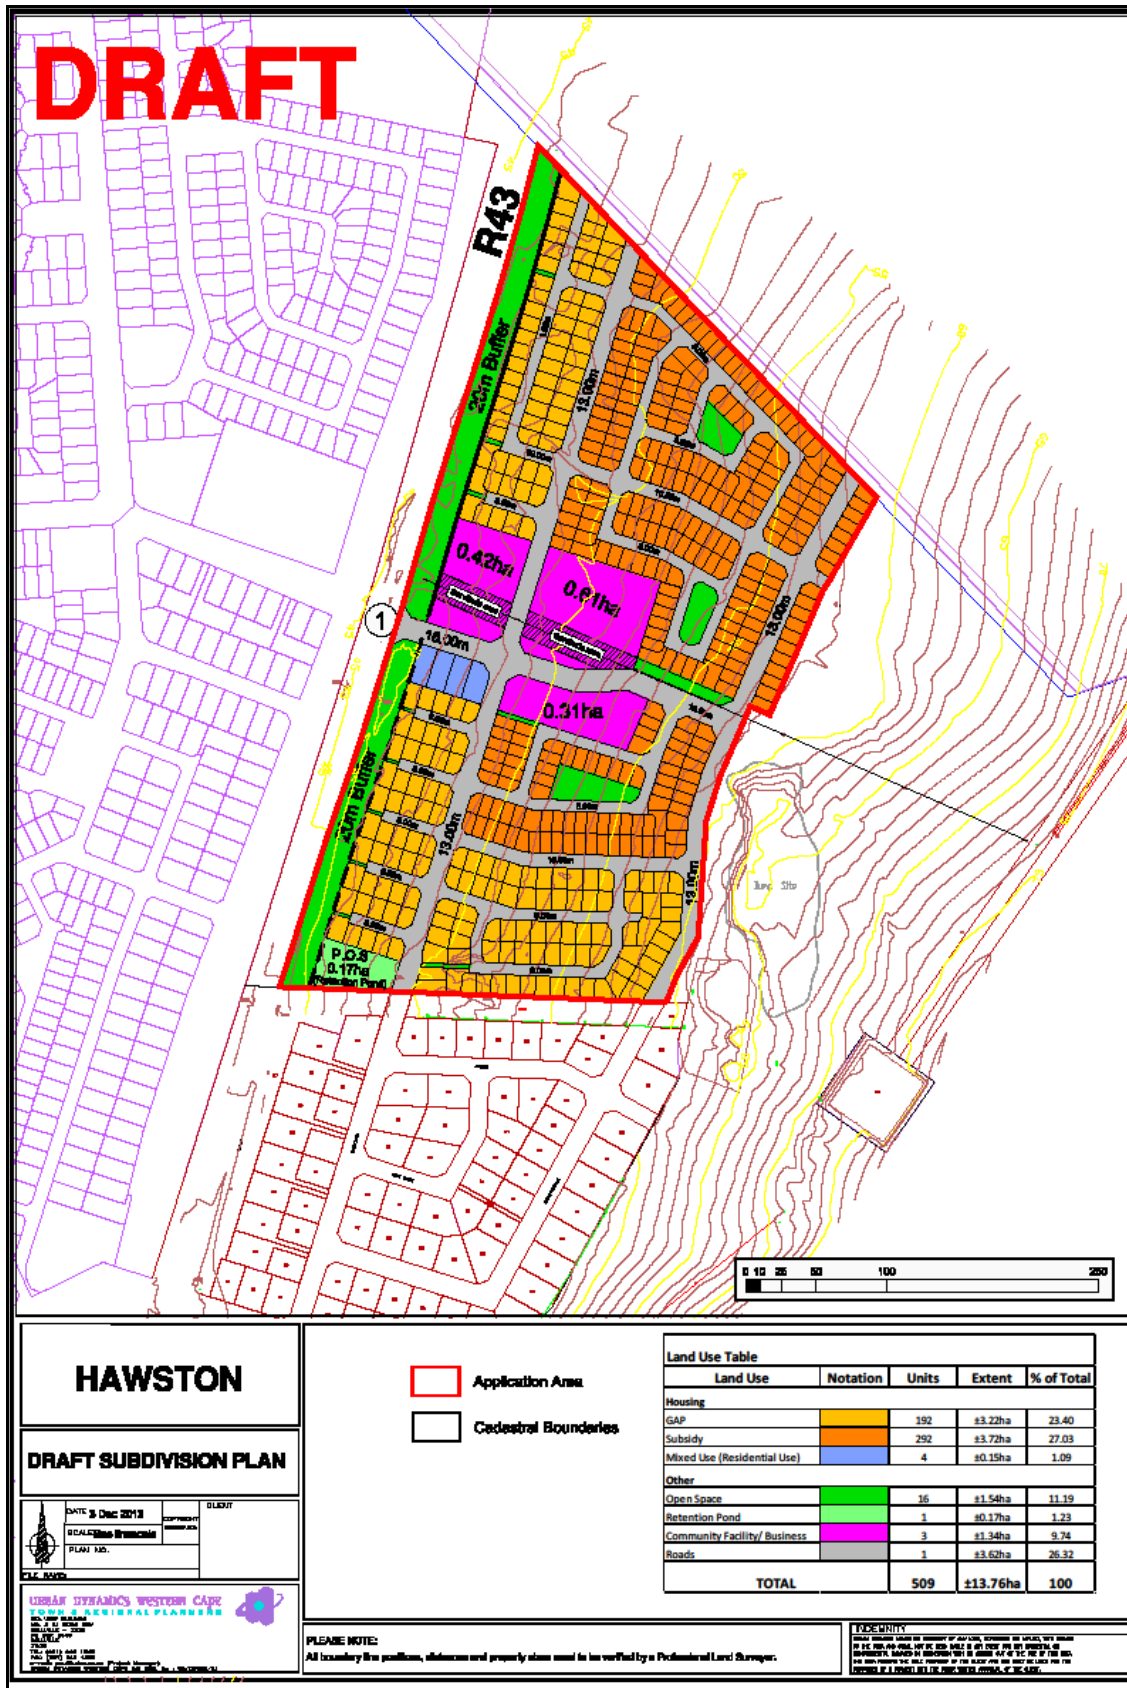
Hawston East housing development: Proposed site development plan (Draft).
